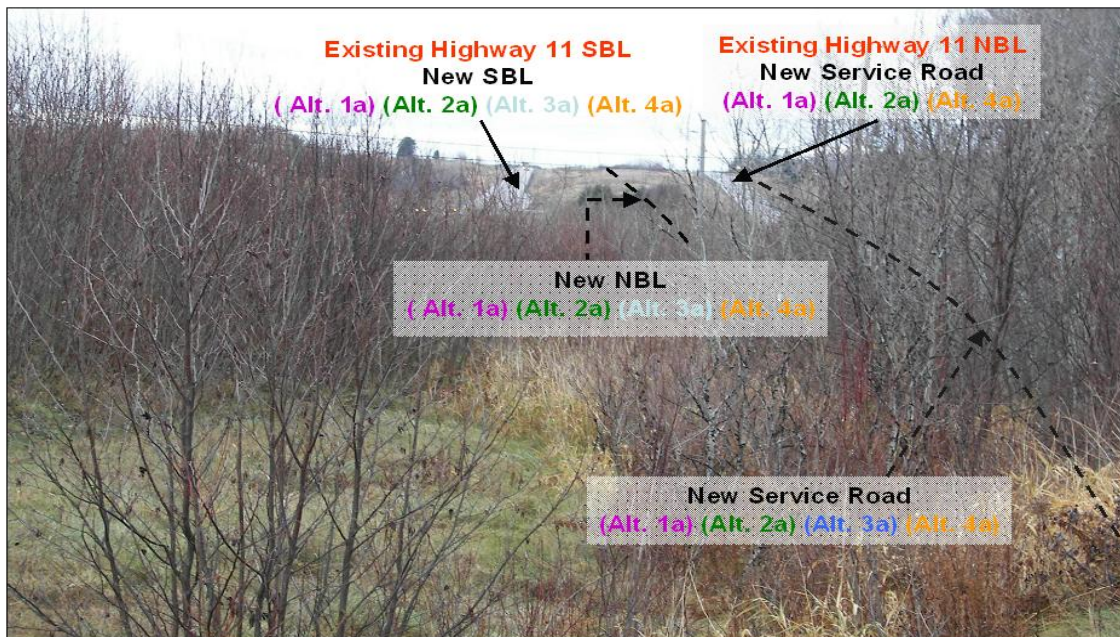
Looking south westerly from entrance to Landfill Site / Hazardous Material Depot of the Municipality of Powassan at start of study section of Highway 11. Proudfoot Road in the foreground. Note hilly terrain. Rock cut at SBL top left corner of photograph. (Nov. 21, 2007)
